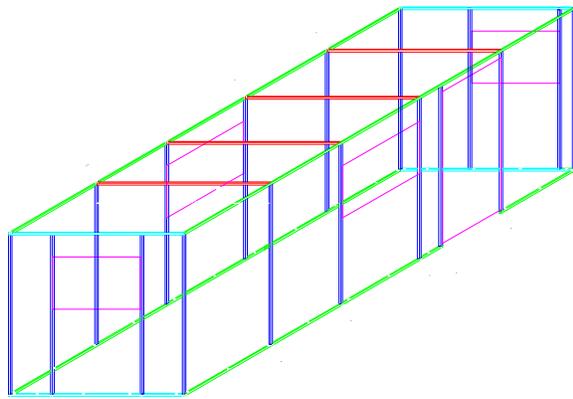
Steel Reinforcement Scheme for Structure 1 Test
